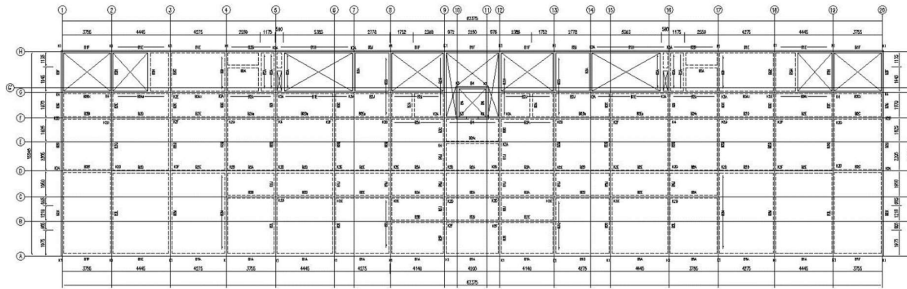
Typical Floor Plan (1st floor – 3rd floor)
